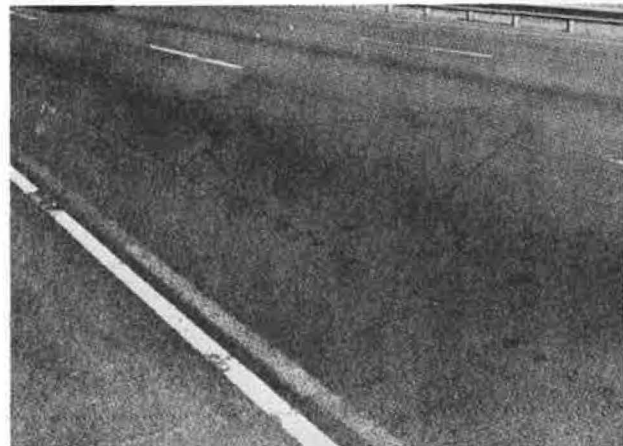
Typical gouge in open-graded surface (southbound, control section).
